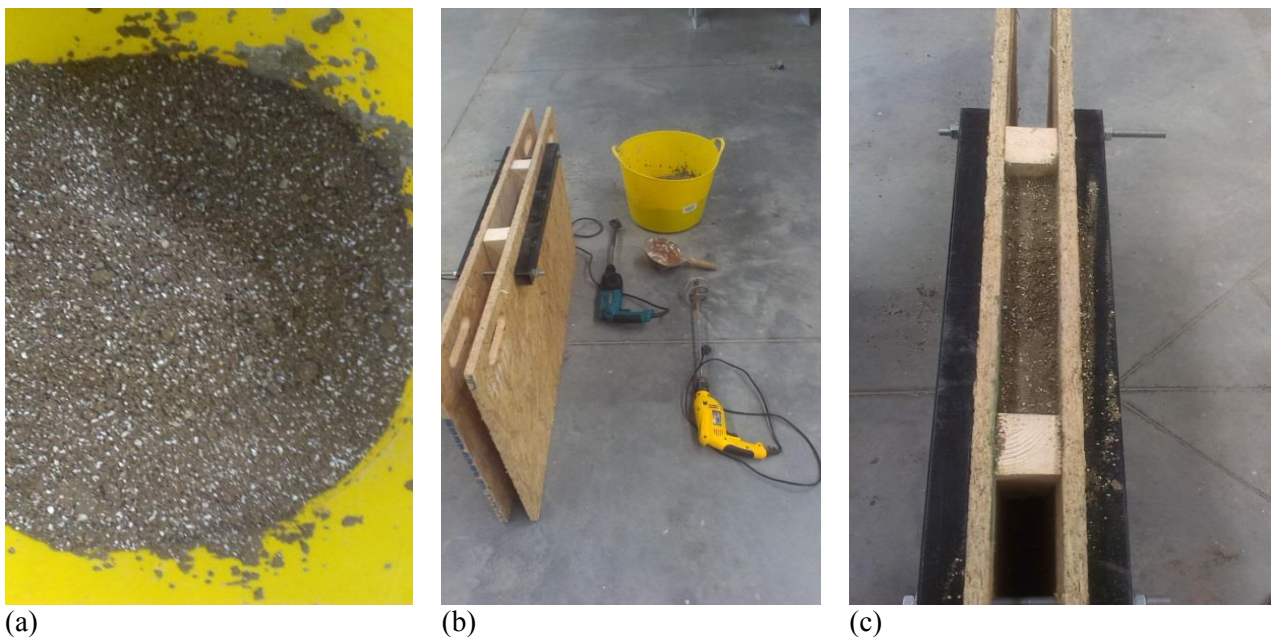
(a) soil and expanded perlite mixture; (b) mixing and compacting equipment; (c) braced formwork with test specimen.
